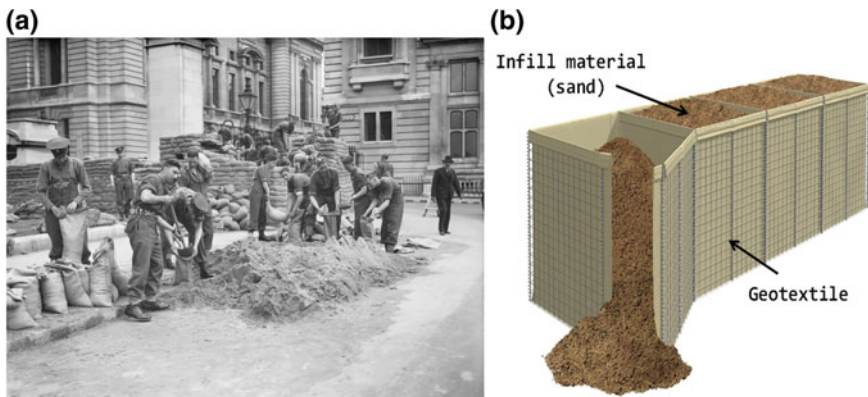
Sand bags used as blast protective barrier walls: a sand bags defence wall were being constructed by the troops in London against possible air strikes in London, 1940 (photograph courtesy: Imperial War Museum); b an illustrative figure of HESCO Bastion concertainer wall units
